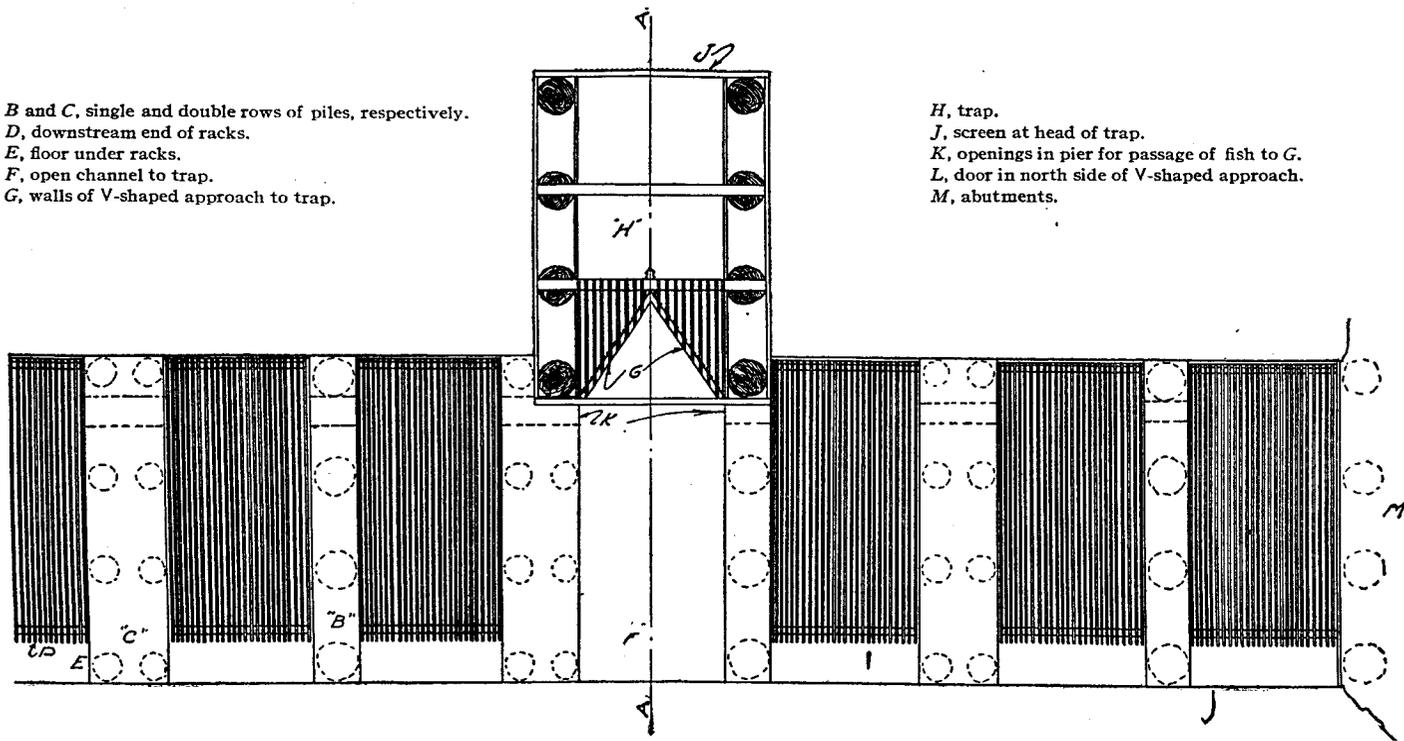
Plan of barrage in Phinney Creek, near Birdsvie, Wash.
